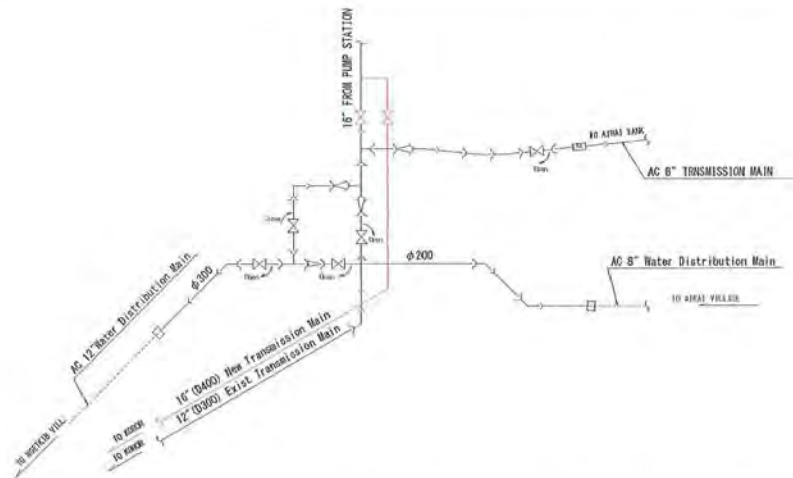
Proposed Connection to Branching from Outlet of KAWTP
